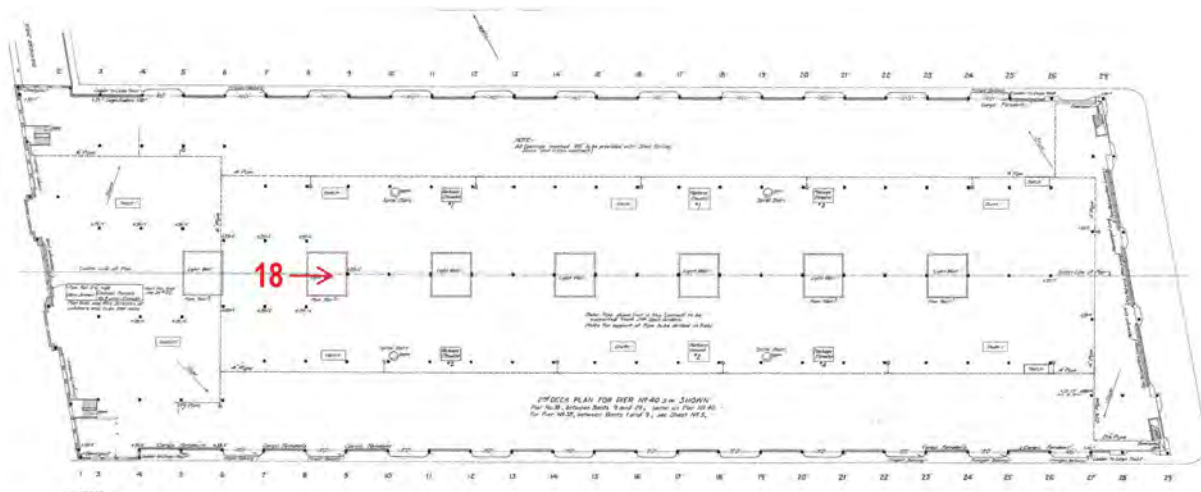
Pier 40 – Plan of second floor with photo key. This plan is taken from the original set of construction drawings and, with the exception of some missing equipment, accurately represents the existing conditions. The storage lockers are not depicted.
